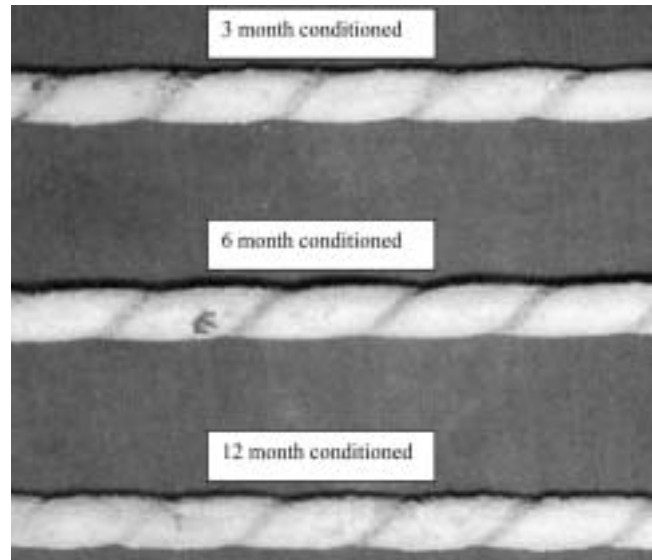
Removed GFRP reinforcing bars from conditioned concrete beams.
